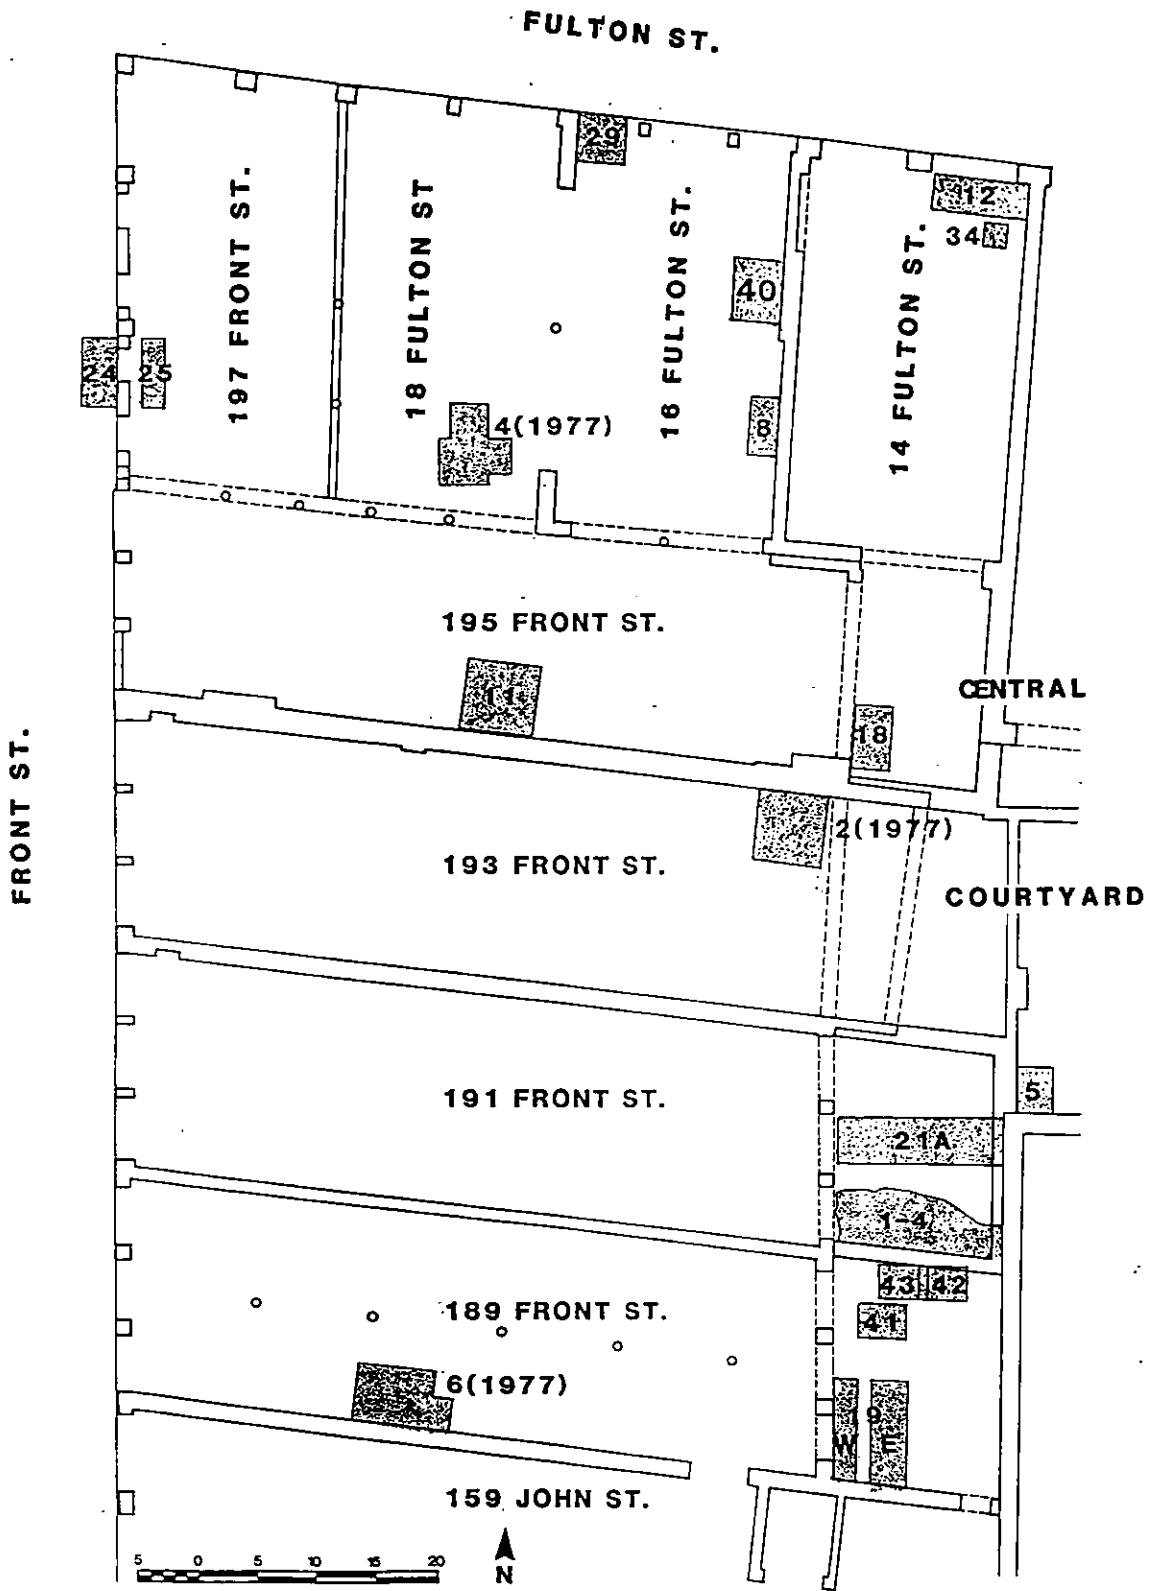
FRONT STREET TEST LOCATION PLAN
